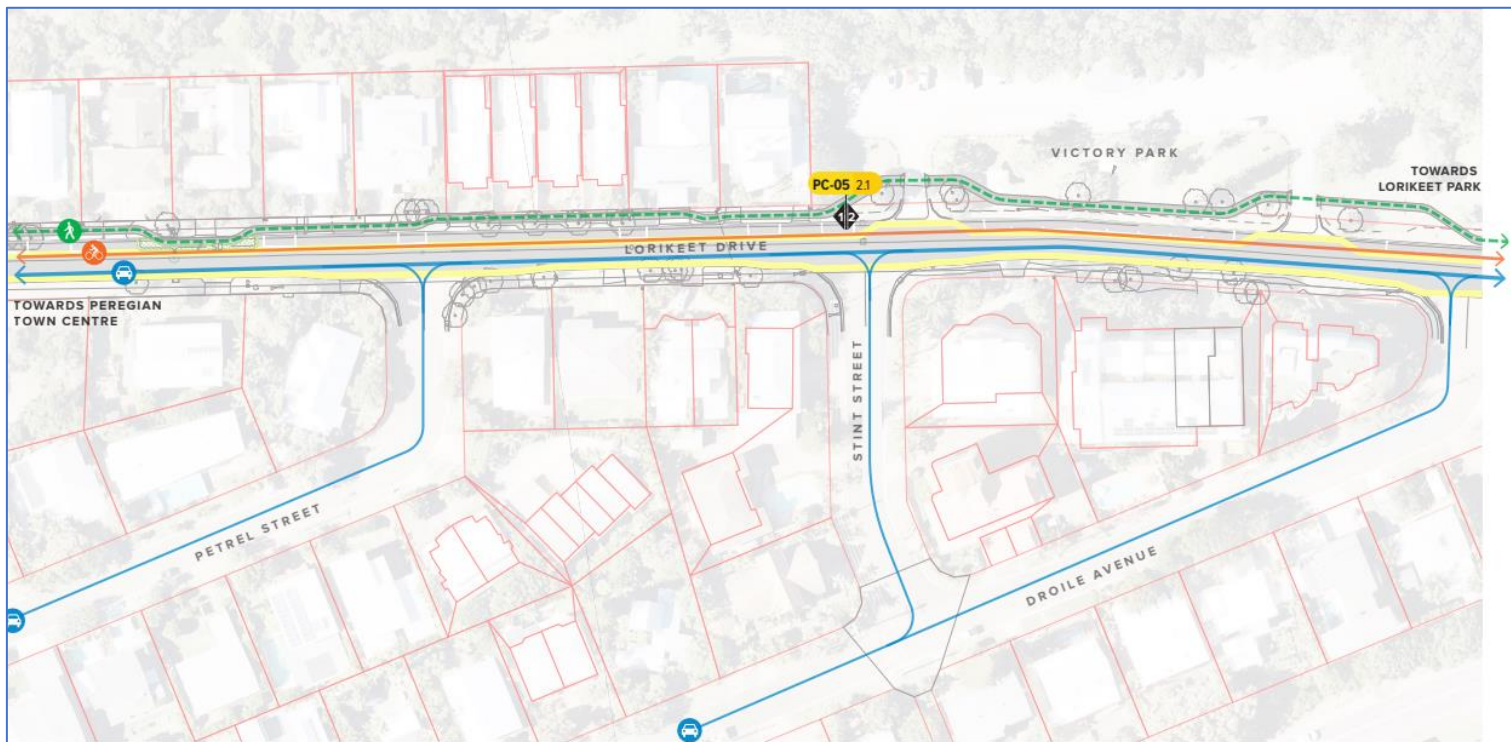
Concept design Lorikeet Drive (Petrel Street towards Pitta Street)
